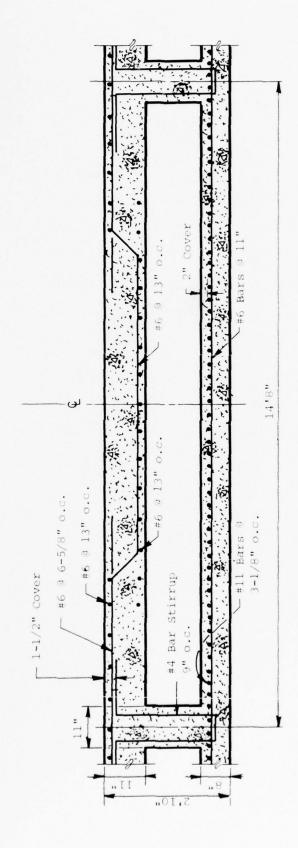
Box Girder for 67-Foot Span 1000 psf Surcharge
